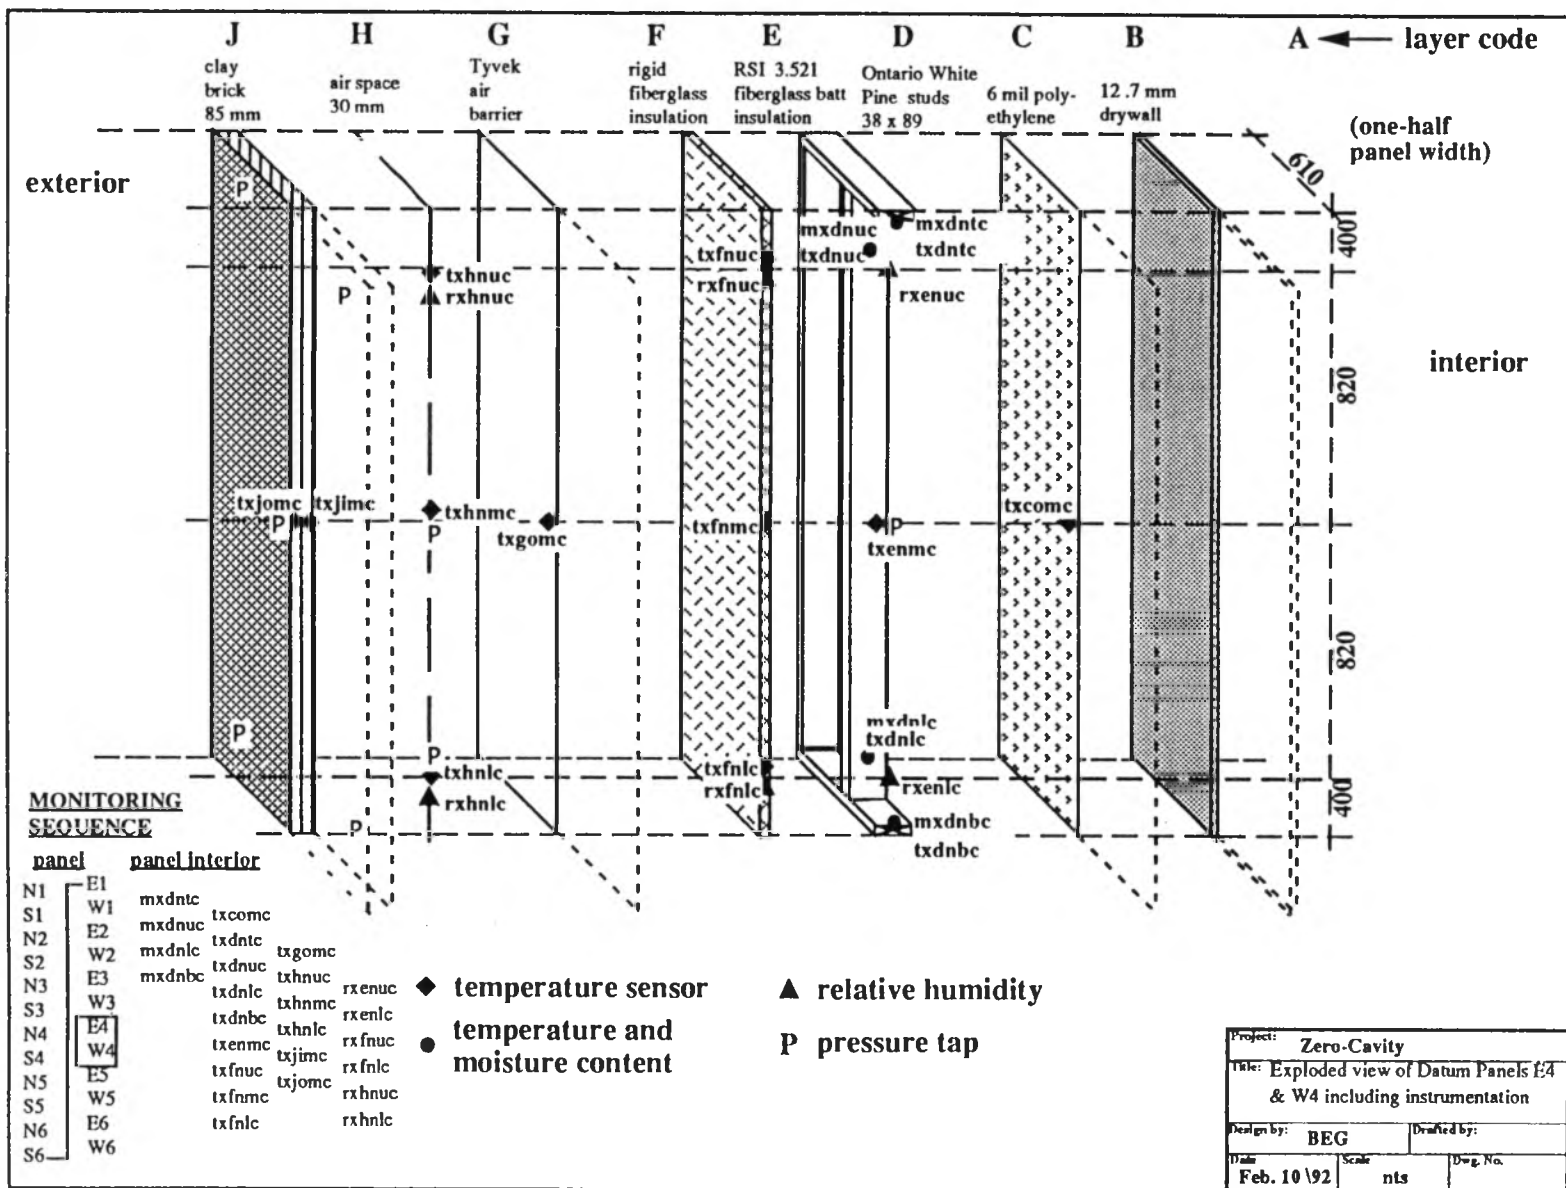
Exploded View of Datum Panel Construction
